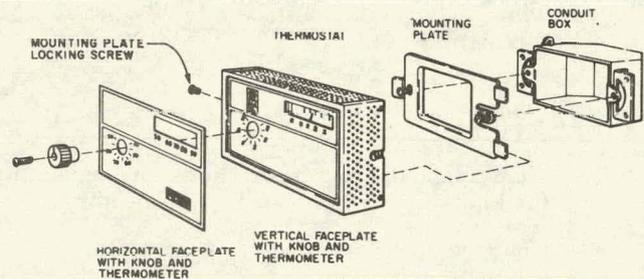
Line drawing illustrating method of mounting a vertical thermostat to a horizontal outlet box and installing a horizontal faceplate.
